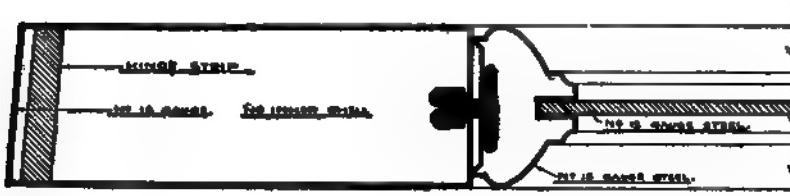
Steel Door with Hollow Stiles and Rails and Single-Thick Sheet-Steel Panels.
